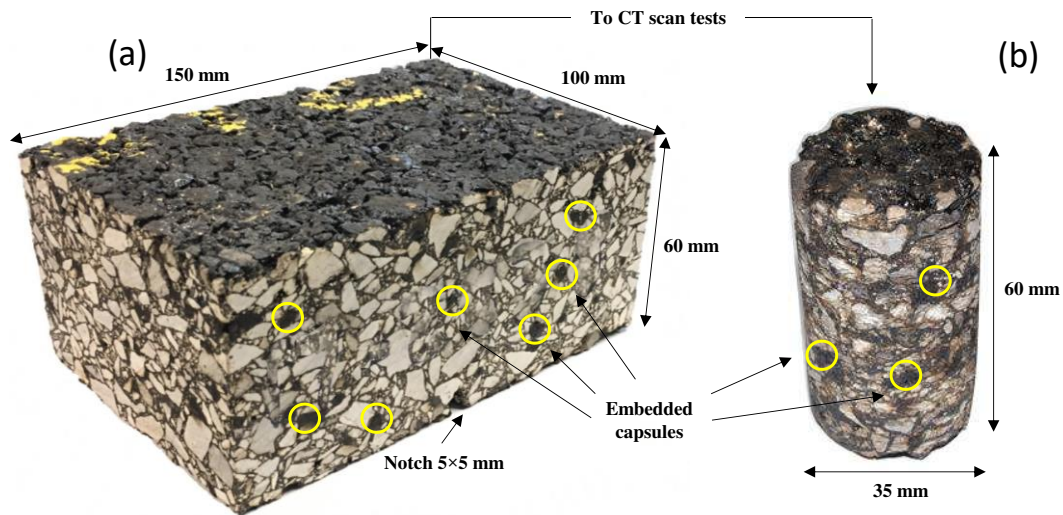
(a) Asphalt beam used in the crack-healing tests, and (b) asphalt core cylinder used in the CT scan tests.
